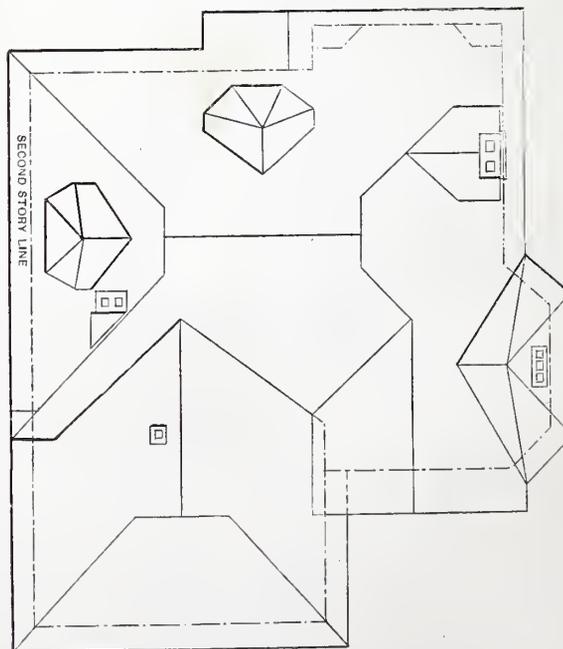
Roof Plan.—Scale, 1-16 Inch to the Foot.
